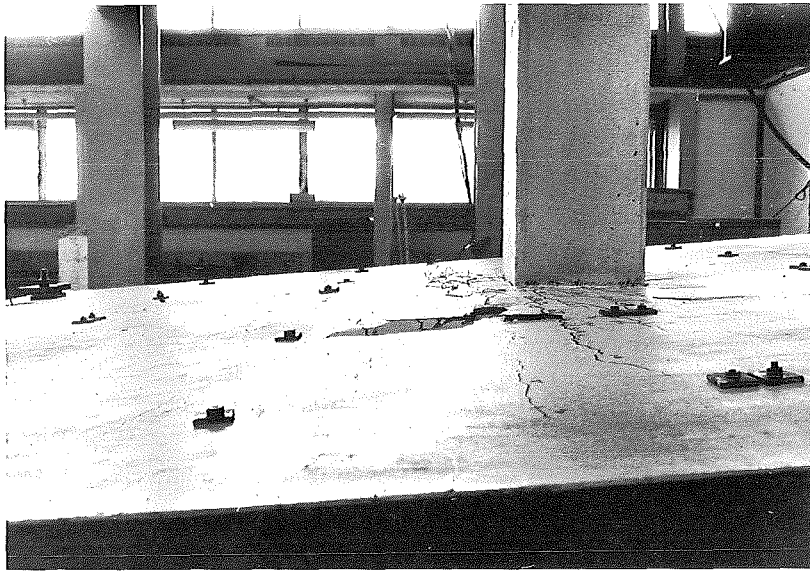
FAILURE SURFACE OF SPECIMEN 2
